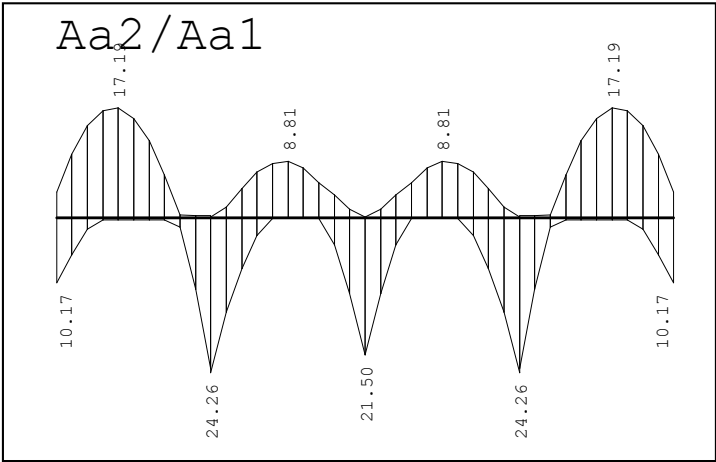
Required reinforcement of representative strip footing [m²] - Model no.1
